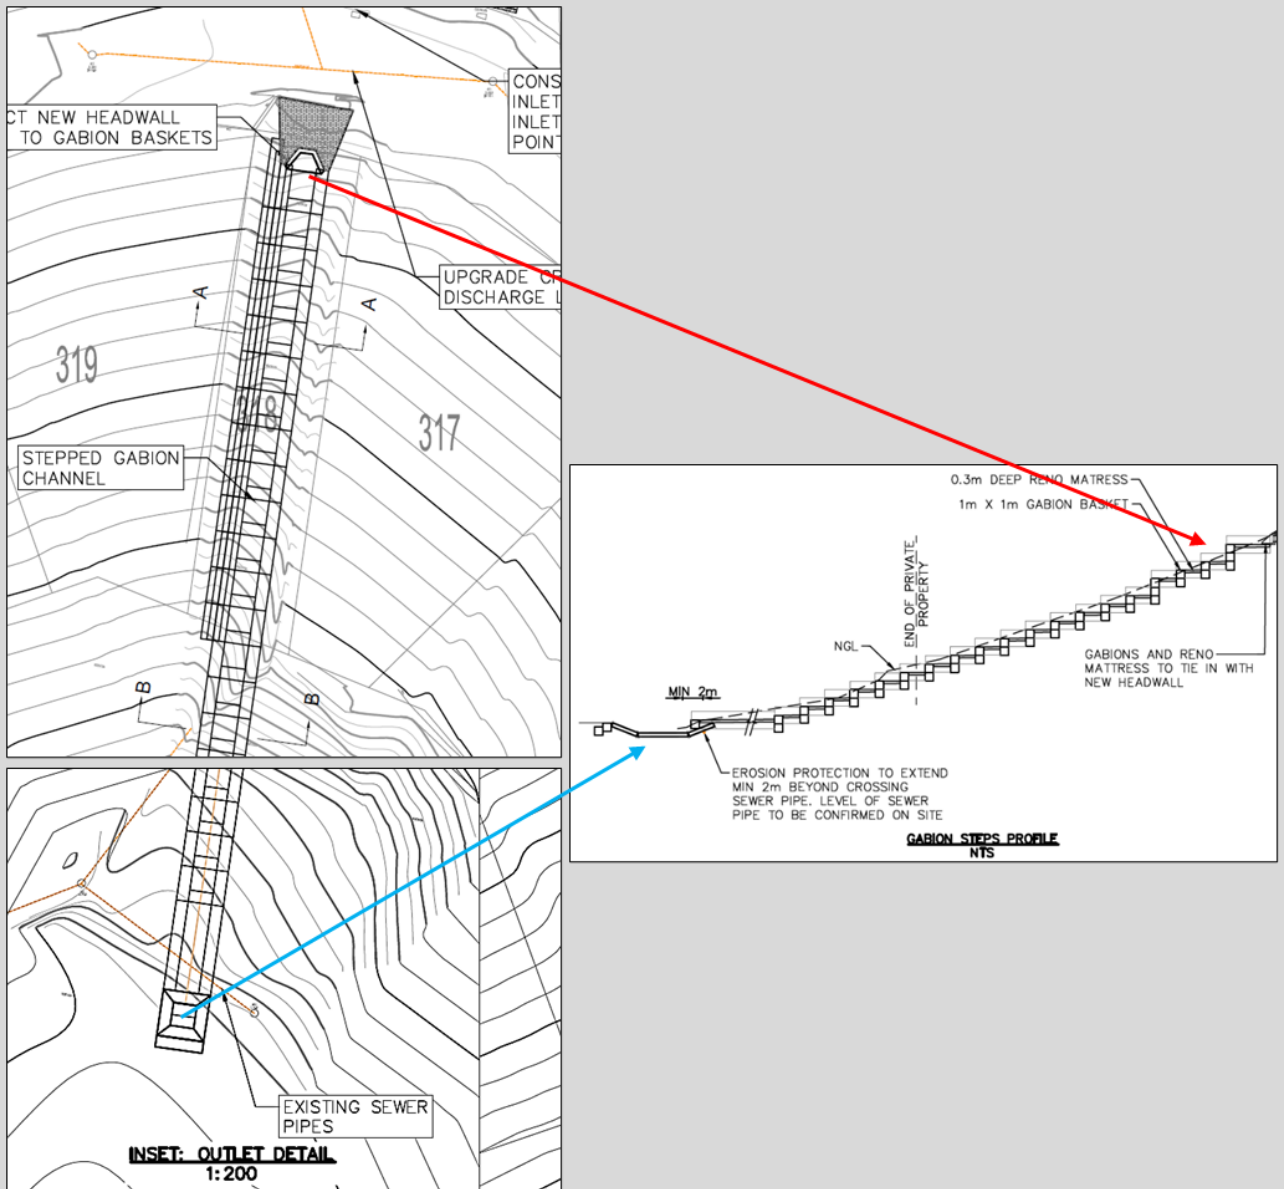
Erosion Protection for erven 318 & 139 (Plan & Section View) – stepped gabion channel ending with a stilling basin approx. 2m beyond the existing sewer pipeline.
